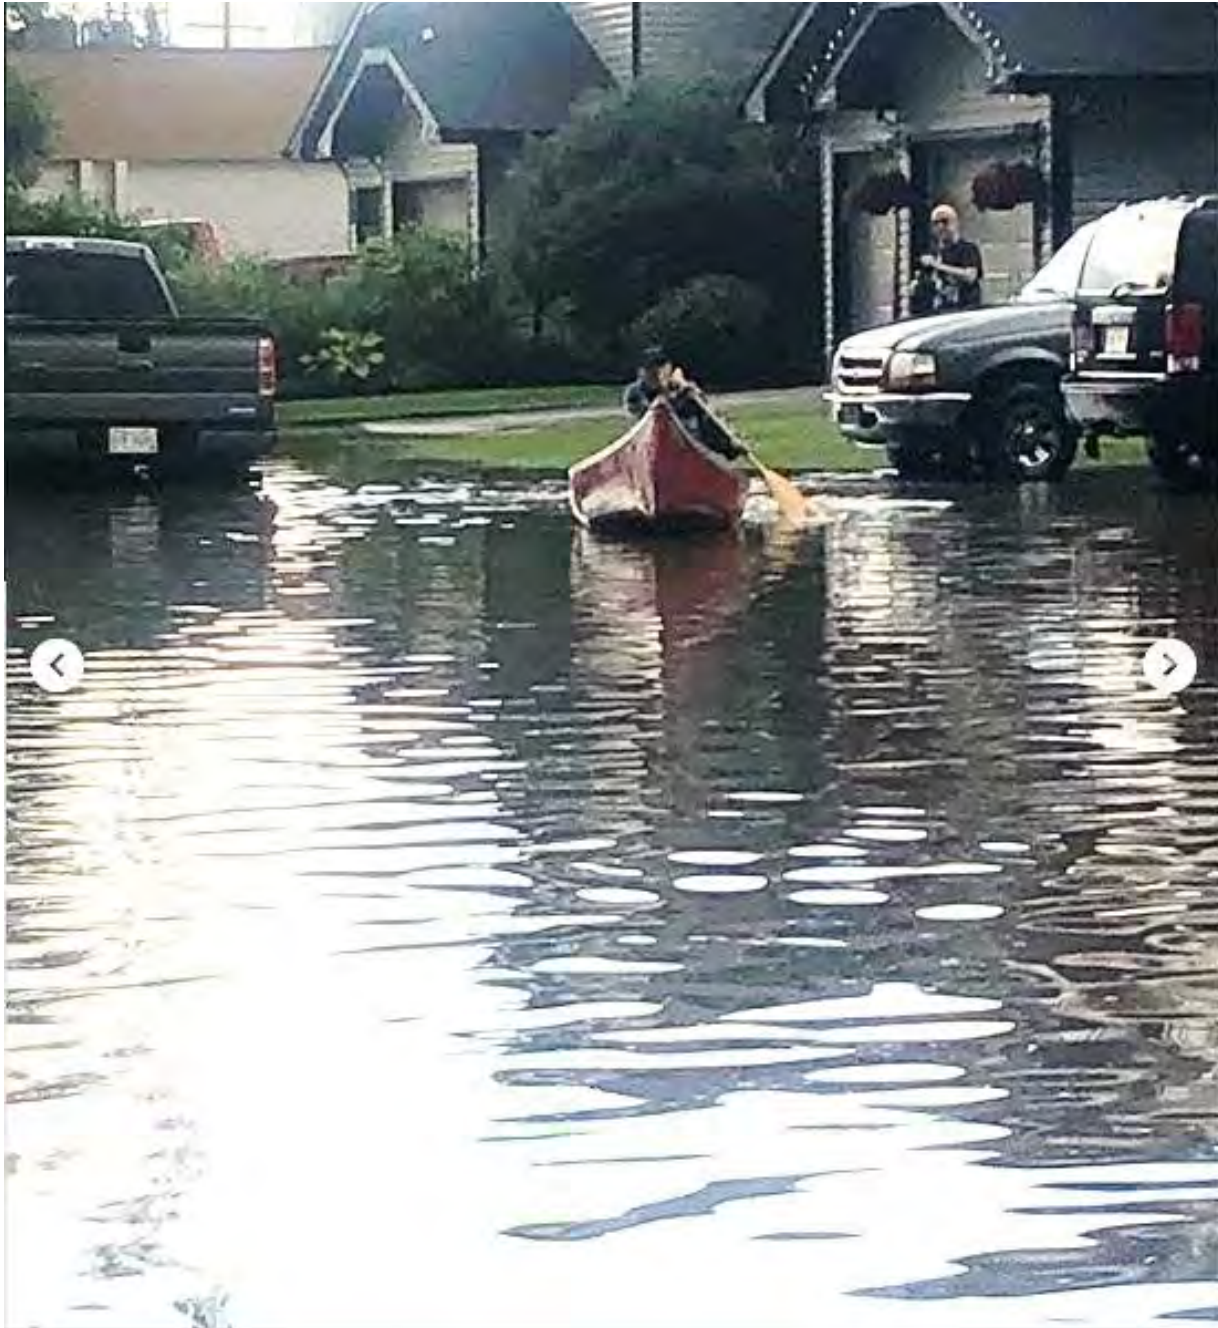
Area B – East of 48 Street and 52 Avenue intersection looking north from 52 Avenue towards the parking lot behind the buildings. Showing ponding on the road and on private property. July 15, 2019 – 7:10PM
